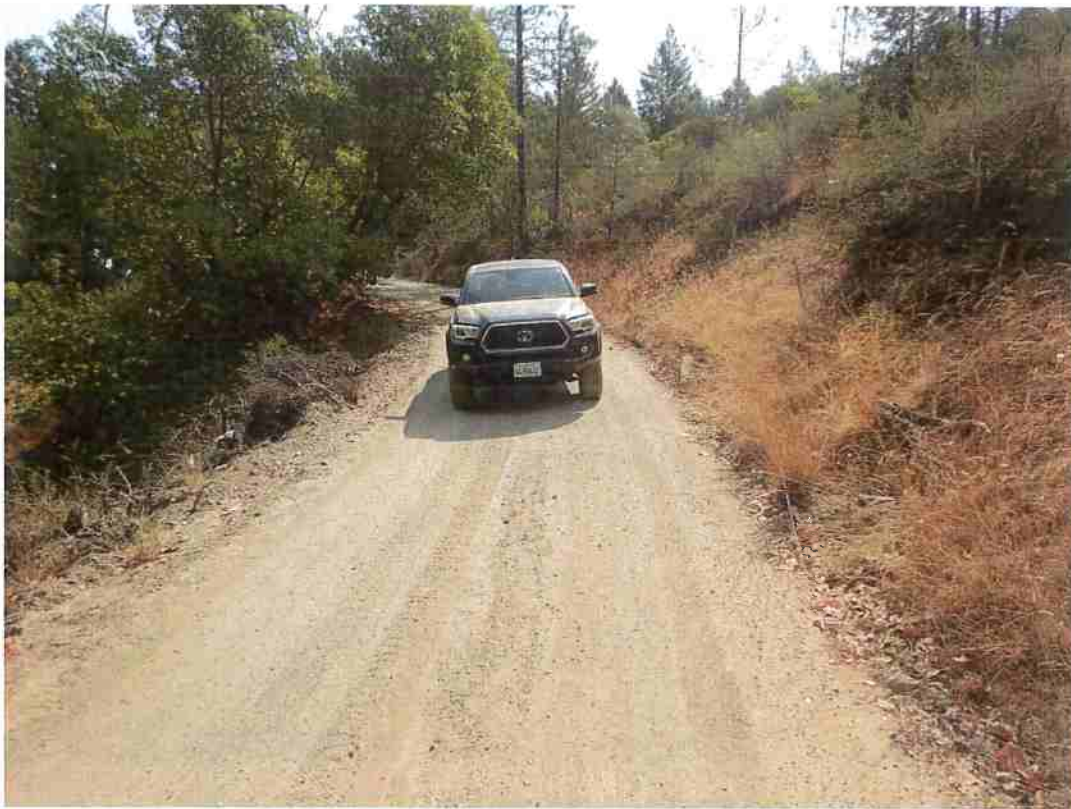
RP 13. Vehicle traveling north-west, photo taken facing south-east.
